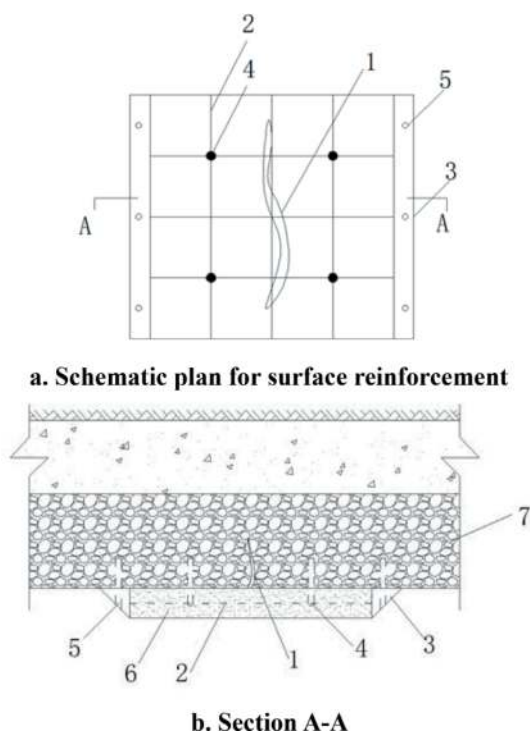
Schematic diagram for surface reinforcement structure. (1 - crack; 2 - surface steel bar; 3 - side retaining structure; 4 - reinforcement anchor bolt; 5 - retaining anchor bolt hole; 6 - mortar cover; 7 - lining).
